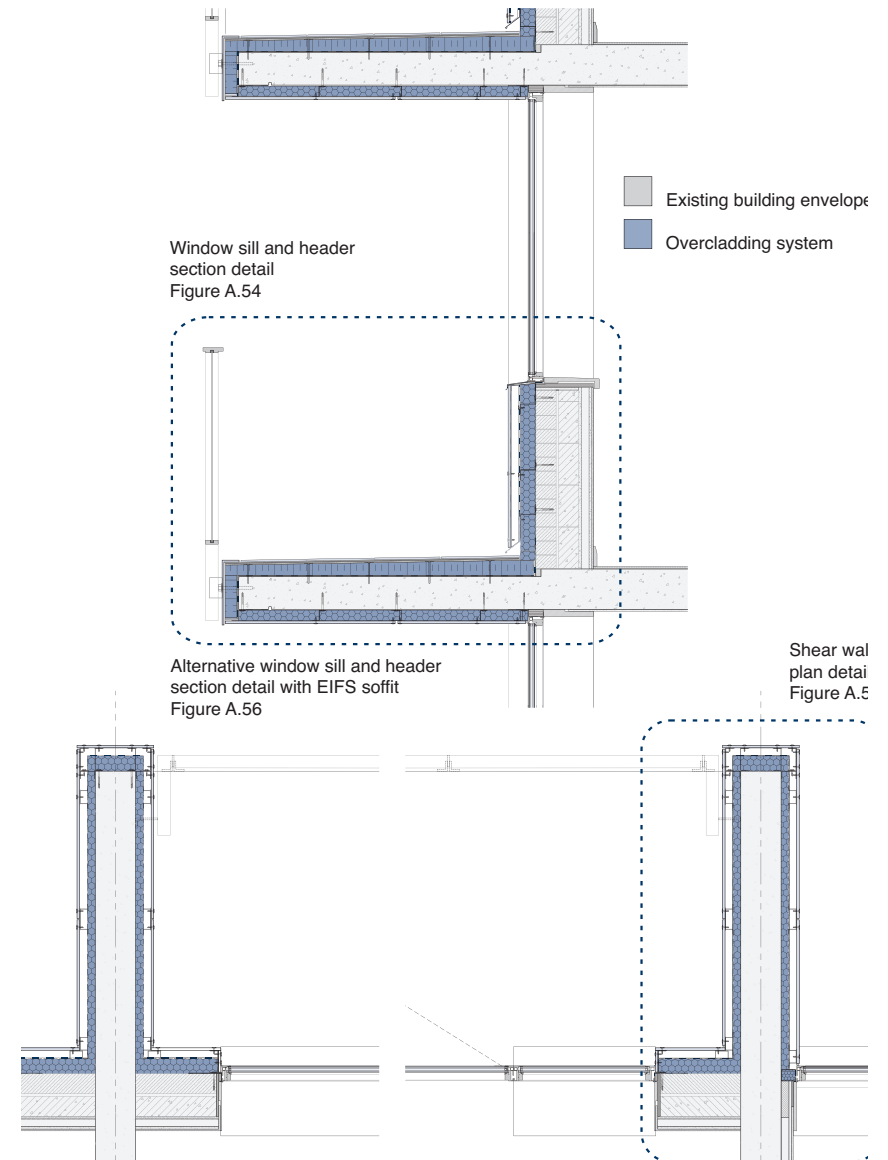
Section and plan views of a balcony overcladding assembly with corresponding detail drawings denoted.
